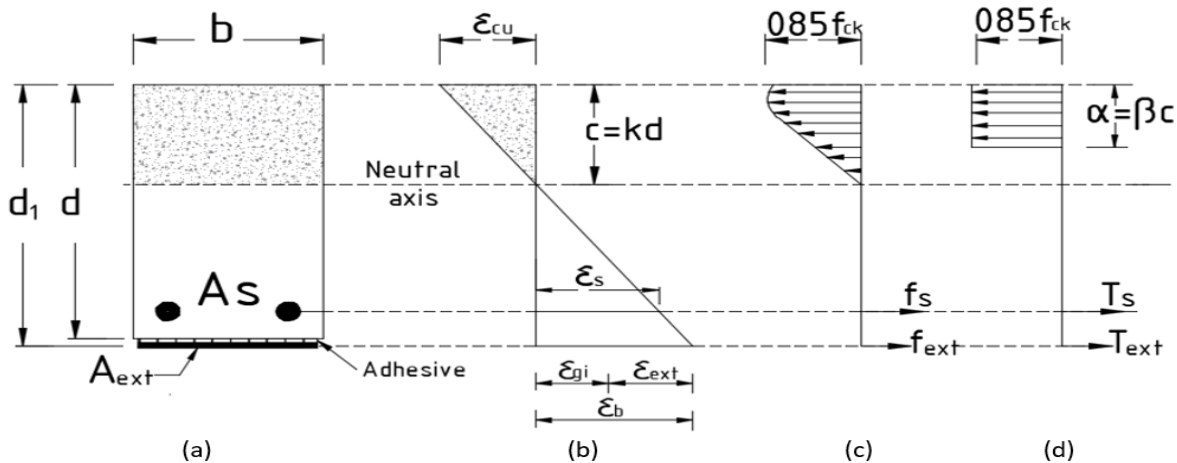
Stress, strain distribution and static equilibrium of forces for beam with external reinforcement: (a) beam cross-section, (b) strain block, (c) parabolic stress block, and (d) rectangular stress block.
